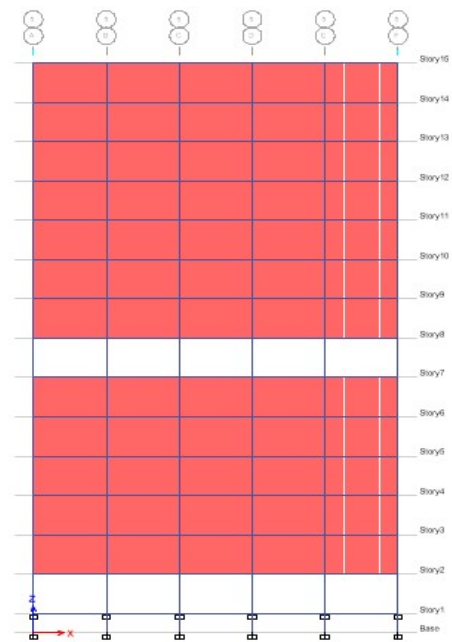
Elevation of multi soft storey at ground and 8th floor
